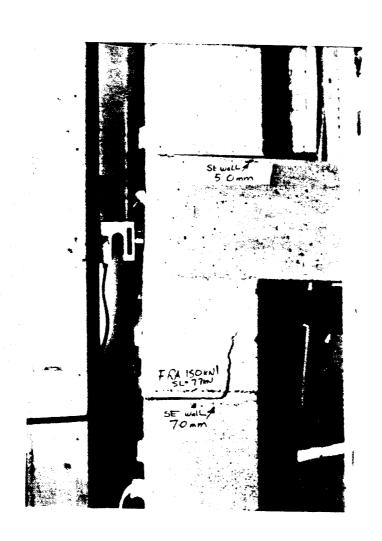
Side View of Crack Distribution at Failure on Specimen FRA150
